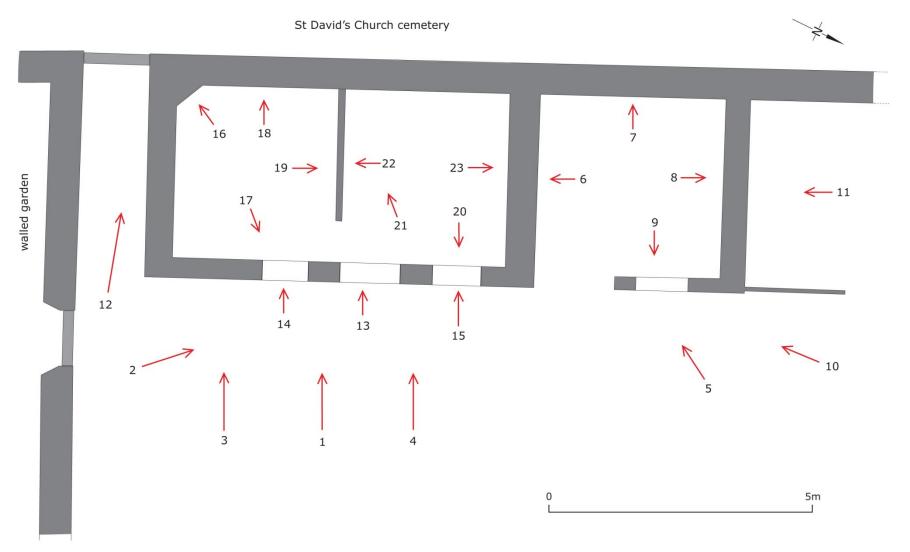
Floor plan of the building known as the Bothy showing position and direction of photographs shown below.
